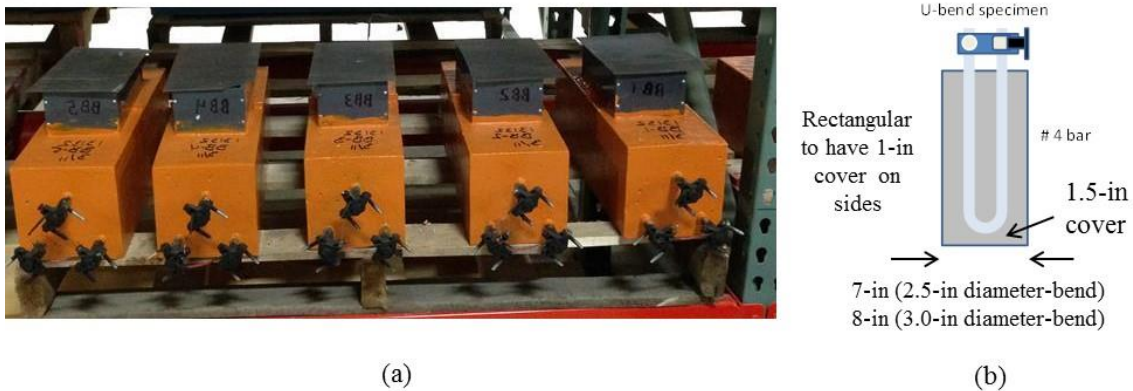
Cracked beam specimens (a) and schematic of U-bend specimen (b).
